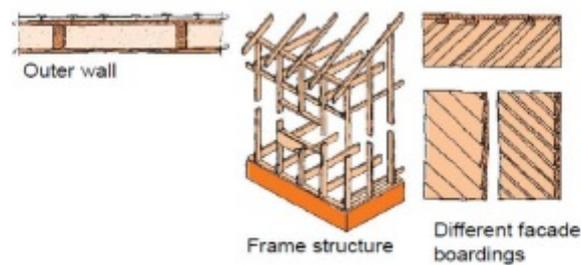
Main construction principle of typical Finnish single-family houses. [12]
